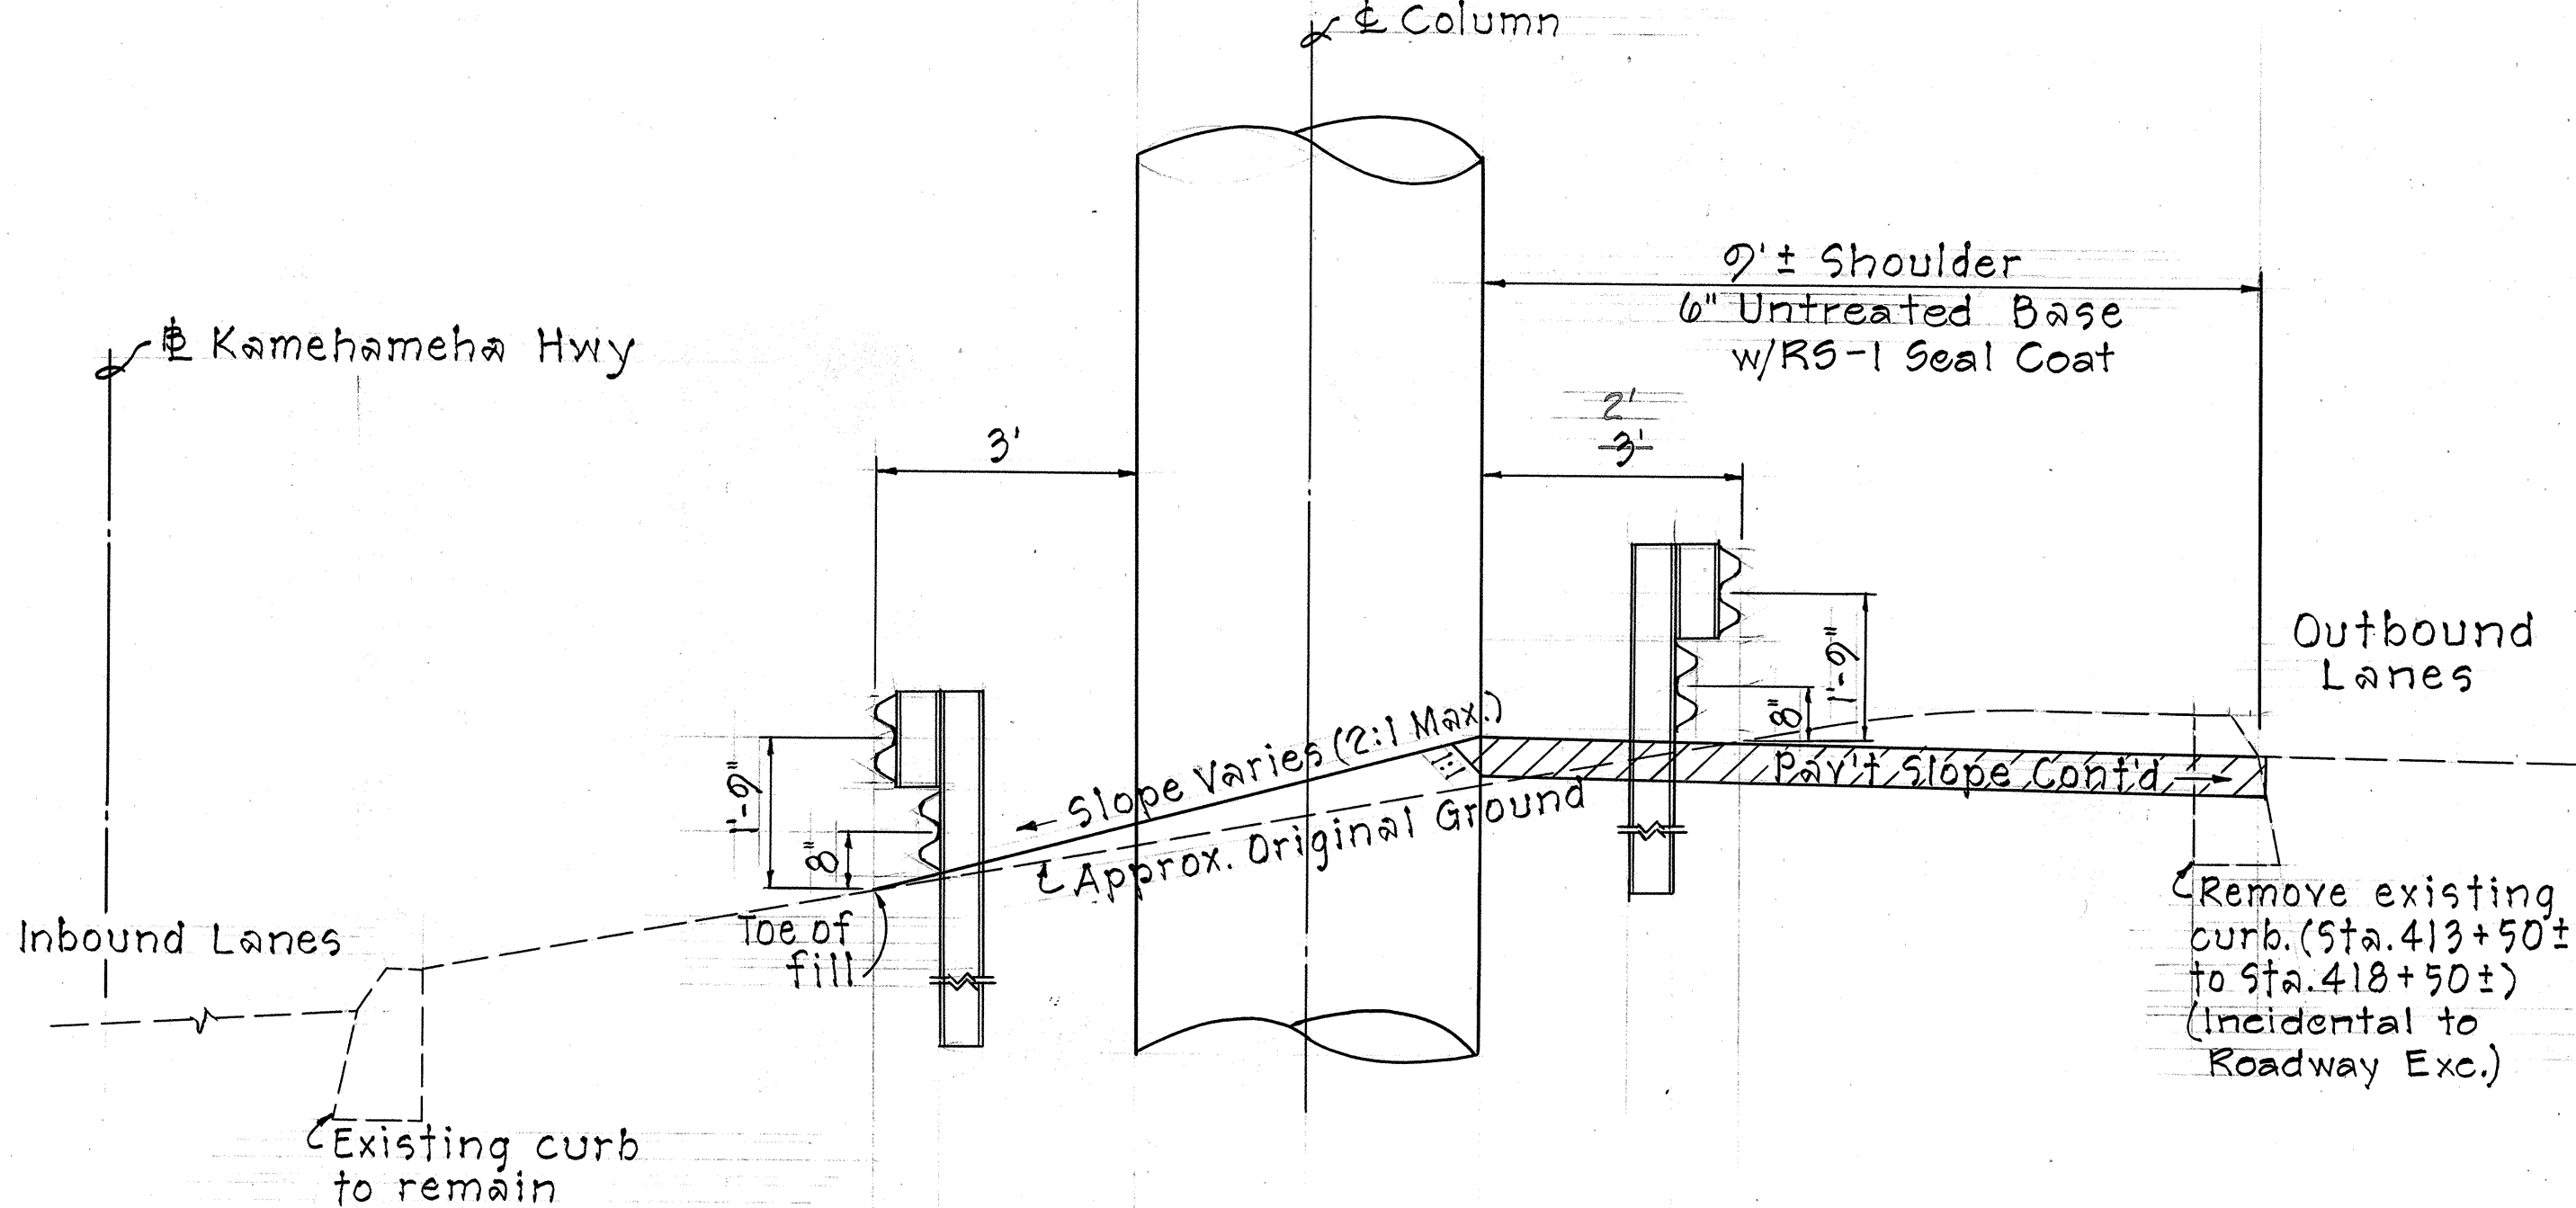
DETAIL OF SPECIAL TYPE "D" METAL GUARD RAIL
